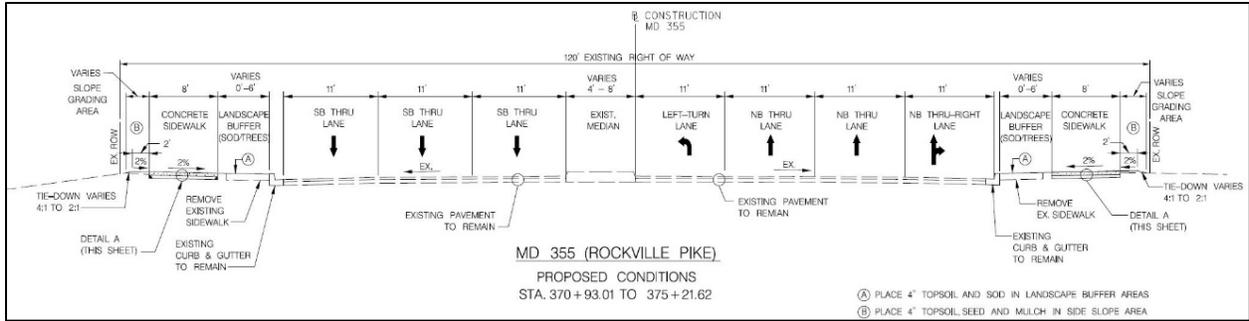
Proposed Phase 1 Typical Cross Section Design – Rockville Pike south of Old Georgetown Road
